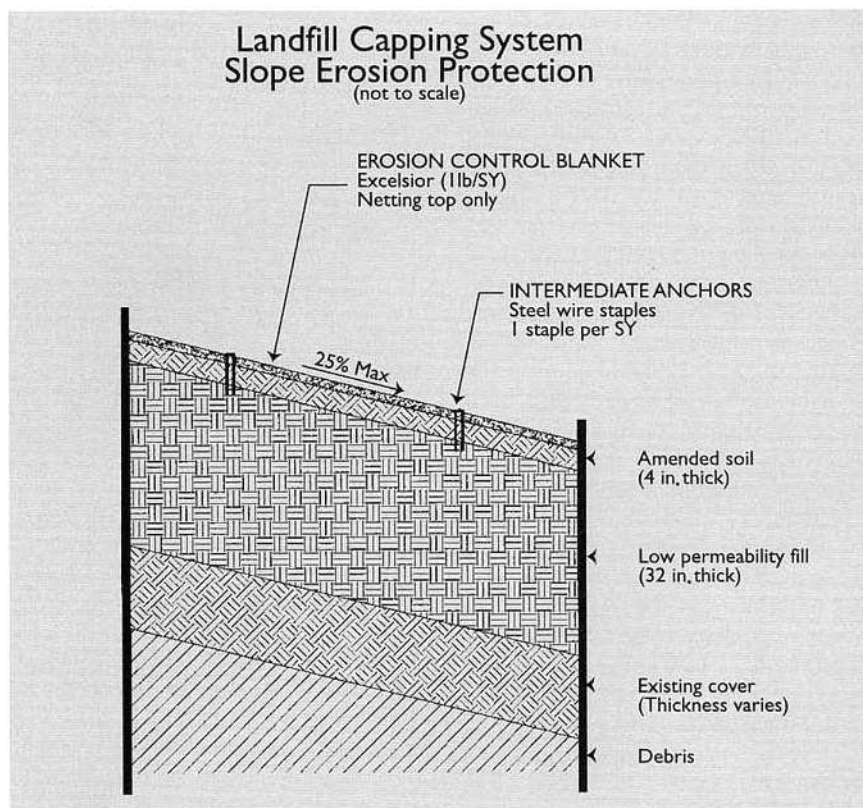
Cross-section: Landfill capping system with slope erosion protection.
